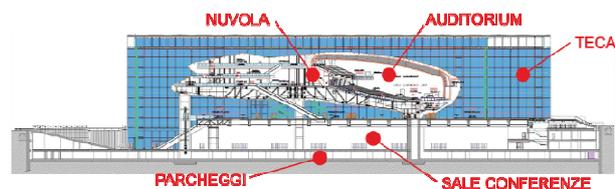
Longitudinal section of "the cloud"/Sezione longitudinale della "nuvola"
